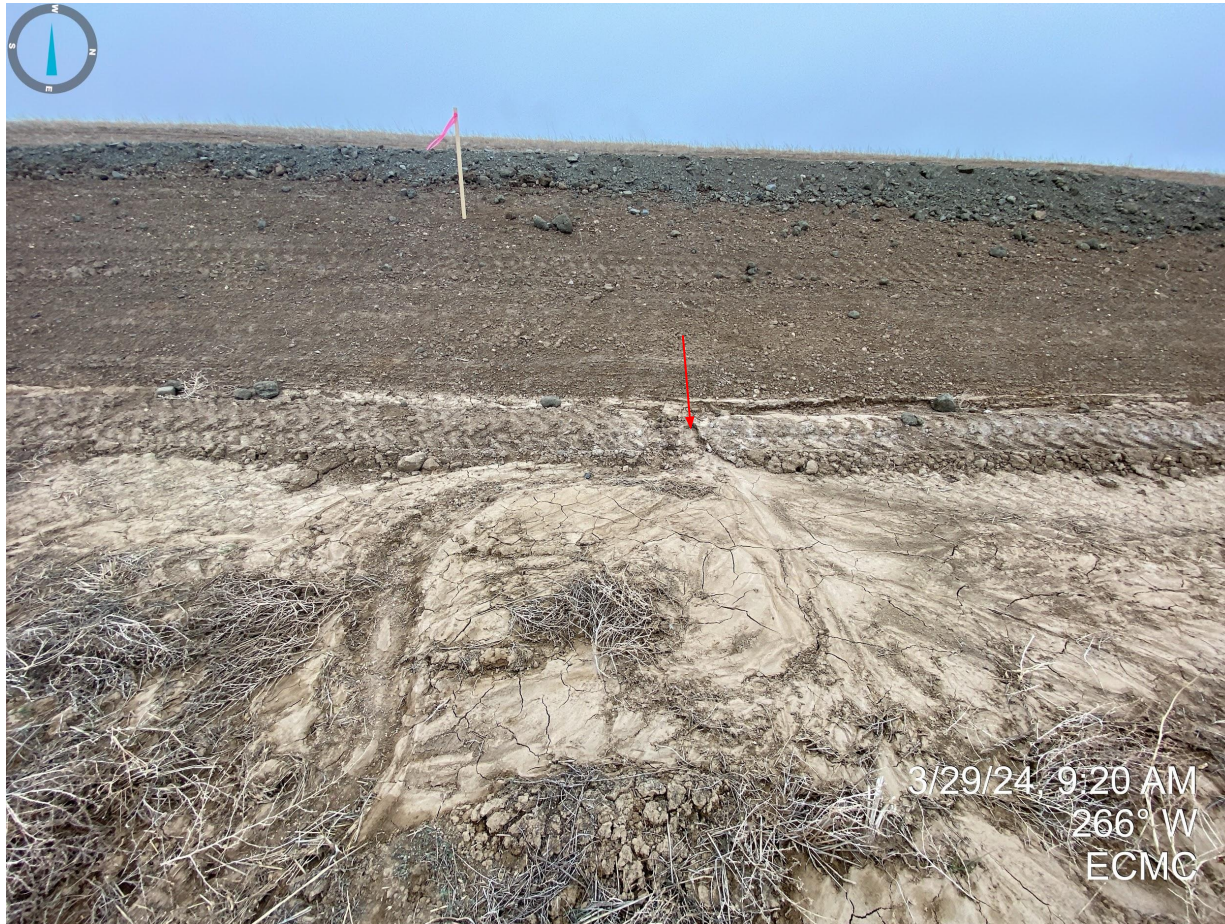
Erosion degradation (riling) occurring along the new access road.
